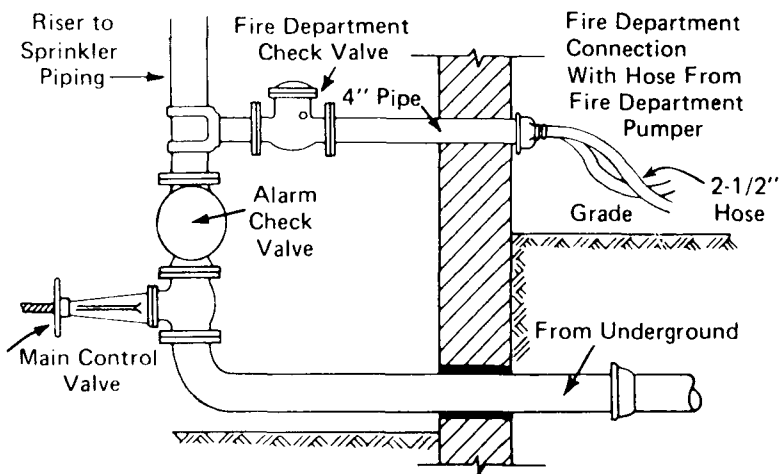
(c). The fire department connection is generally arranged so that water can be pumped to the sprinklers even though the main sprinkler control valve and sprinkler shutoff valve happen to be closed. Also, the use of the fire department pump makes it possible to provide better pressures for the sprinklers than is normally available from a gravity tank or city main.
